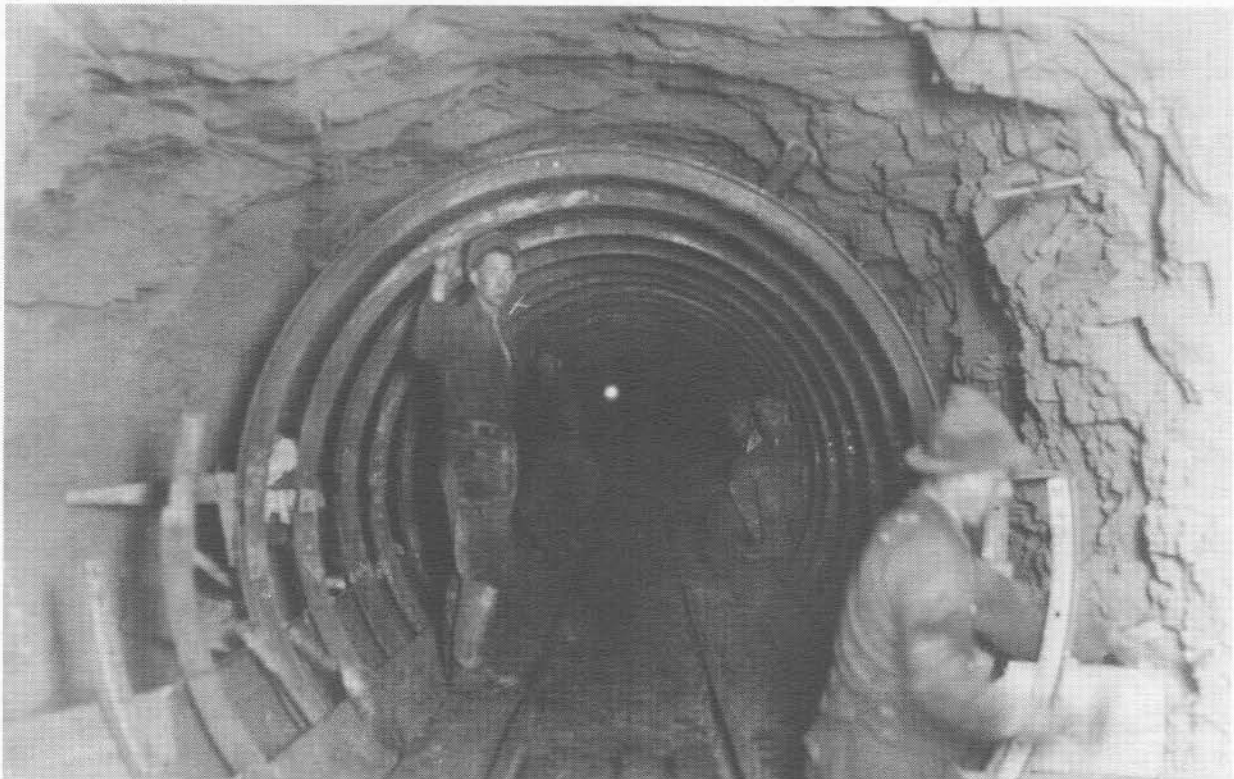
Construction phase of the Missouri Valley Tunnel, February 12, 1926. View is along a segment of the tunnel about 1,400 feet from one of the shafts. The rock walls were supported with temporary forms until a finished concrete liner could be installed.
